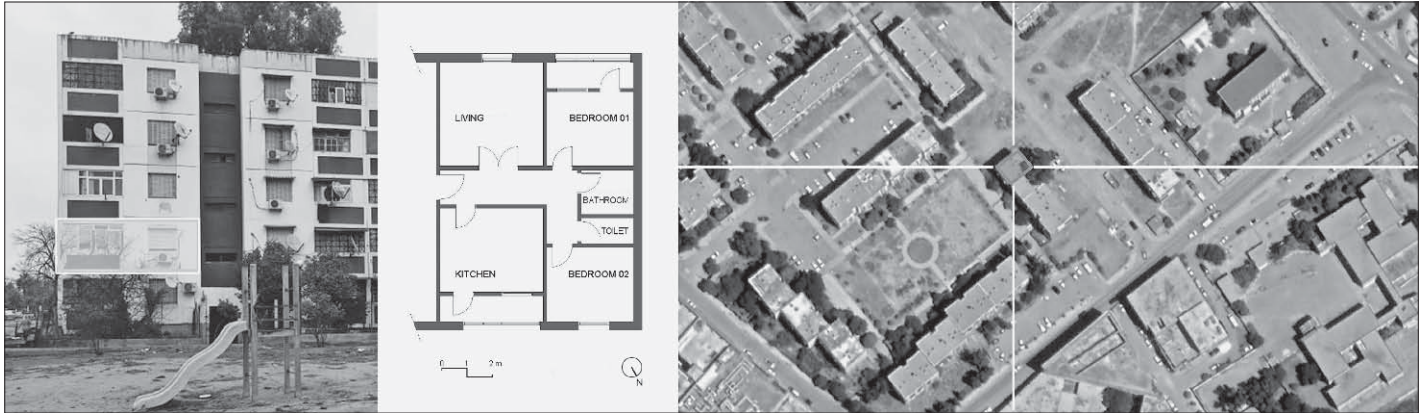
CASE STUDY BUILDING: (A) CASE STUDY BUILDING FAÇADE REAL PICTURE, (B) PLAN OF THE CASE STUDY APARTMENT, (C) SITE PLAN WITH CASE STUDY BUILDING LOCATED
